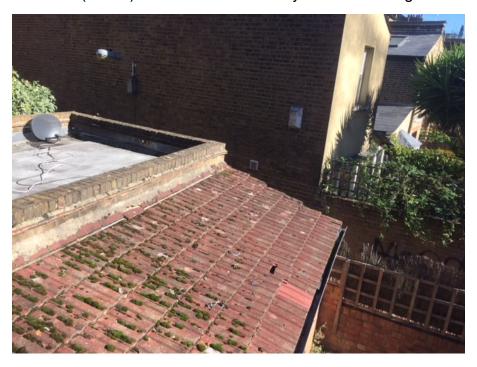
(above): Existing single storey rear extensions at No. 70 (flat roof) and No. 68 (pitched tiled roof) Highgate Road
